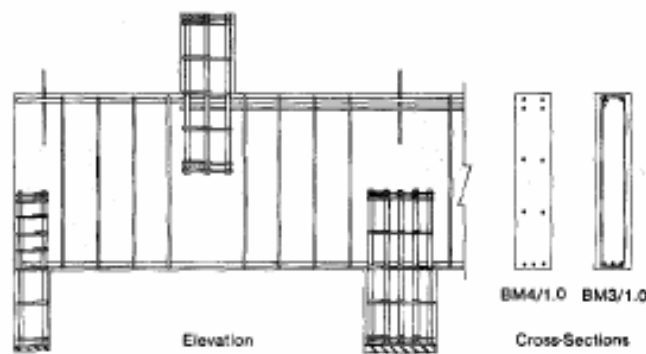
Typical reinforcement details of specimens (Rogowsky, et al.)
